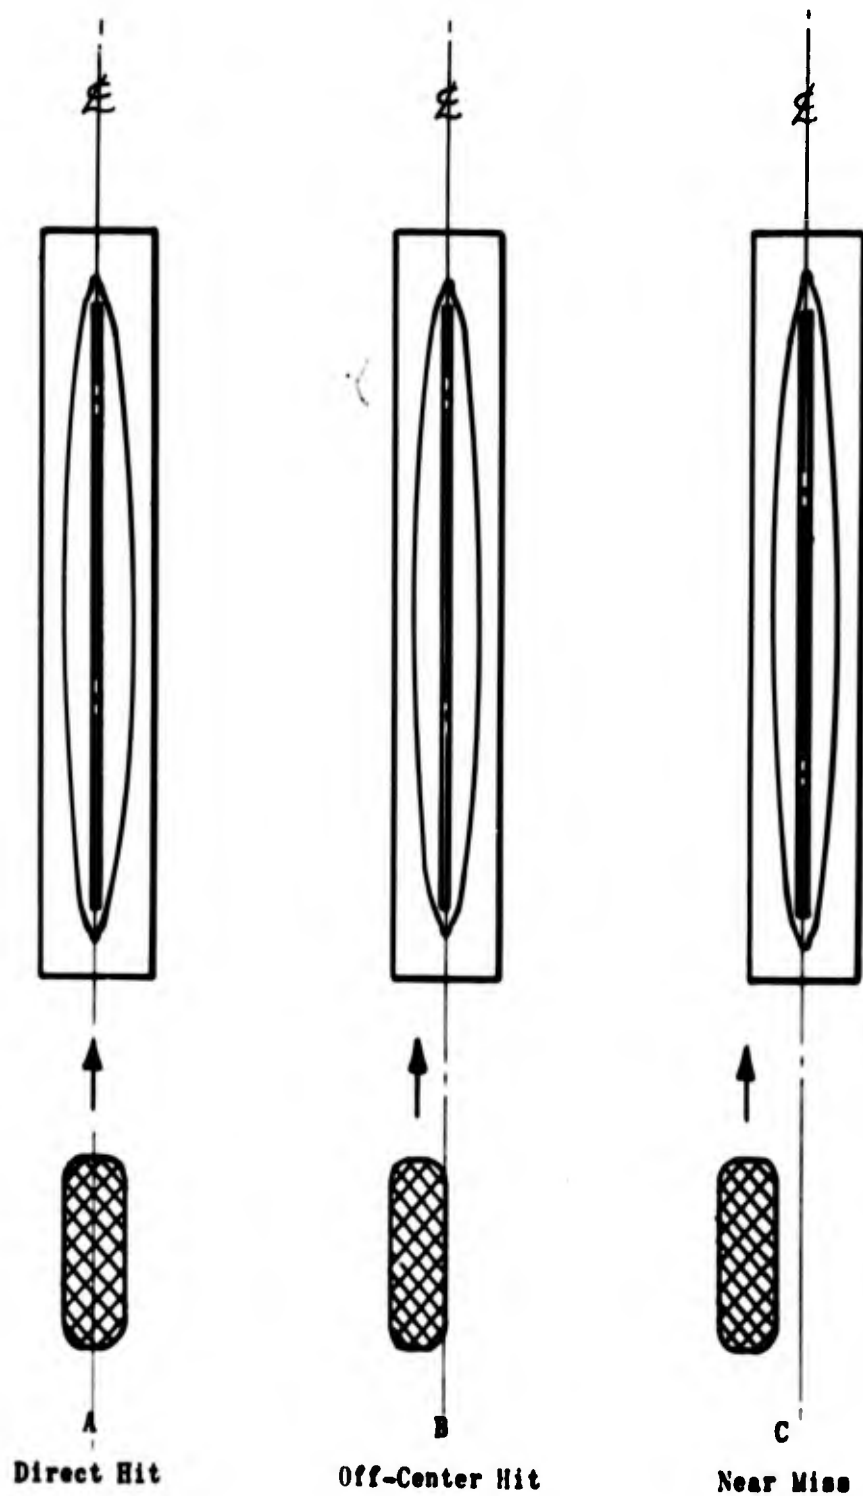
DEFINITION OF ROLL-OVER POSITIONS
